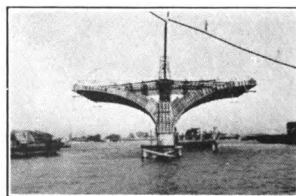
Cantilever arch construction. Constructing first unit. Hanover St. Bridge, Baltimore.
